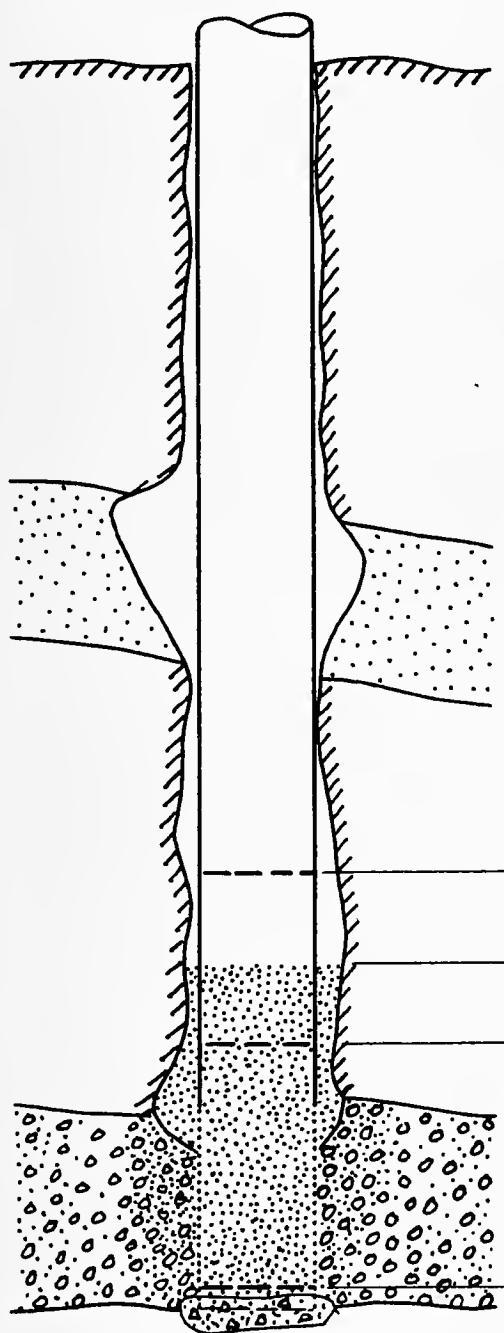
Arrangement for Using a Double Air Packer Plug to Test a Well.
